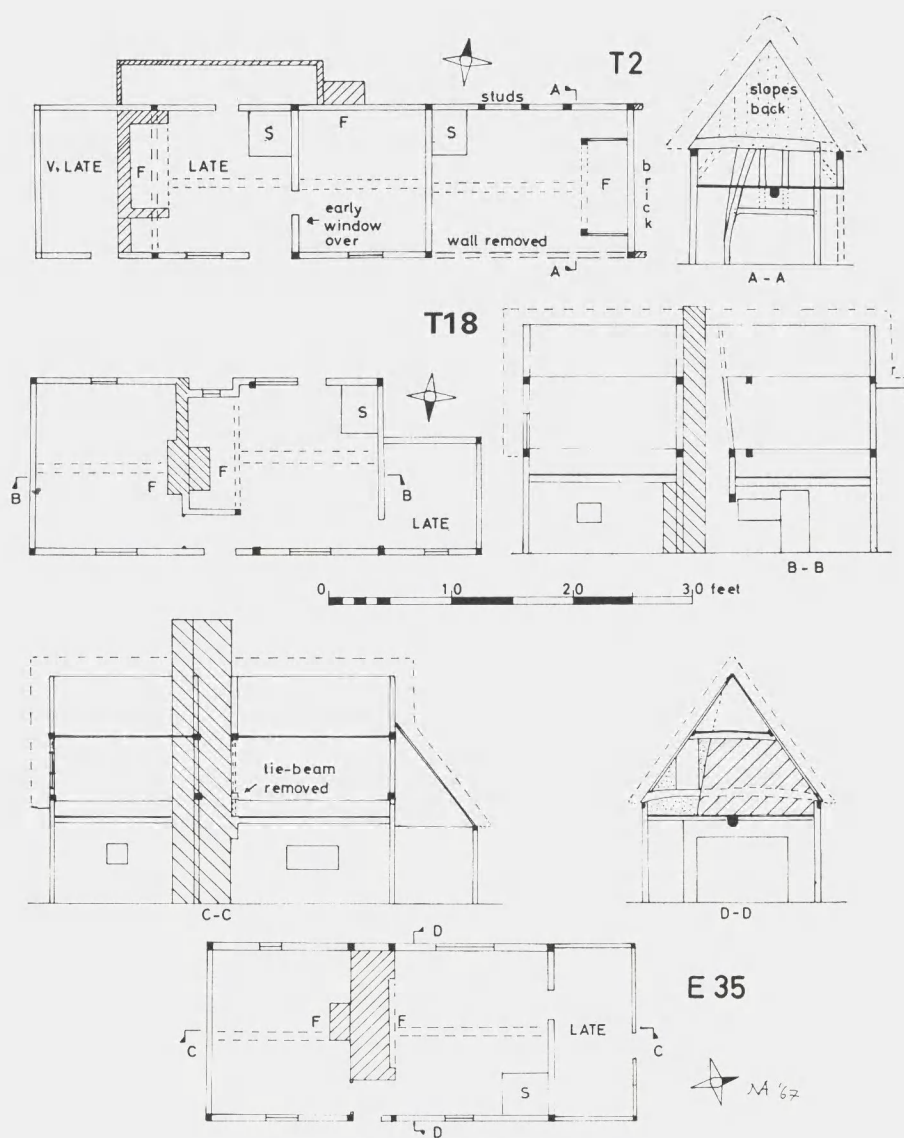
Two room houses, plans and sections. Shading = brickwork.
